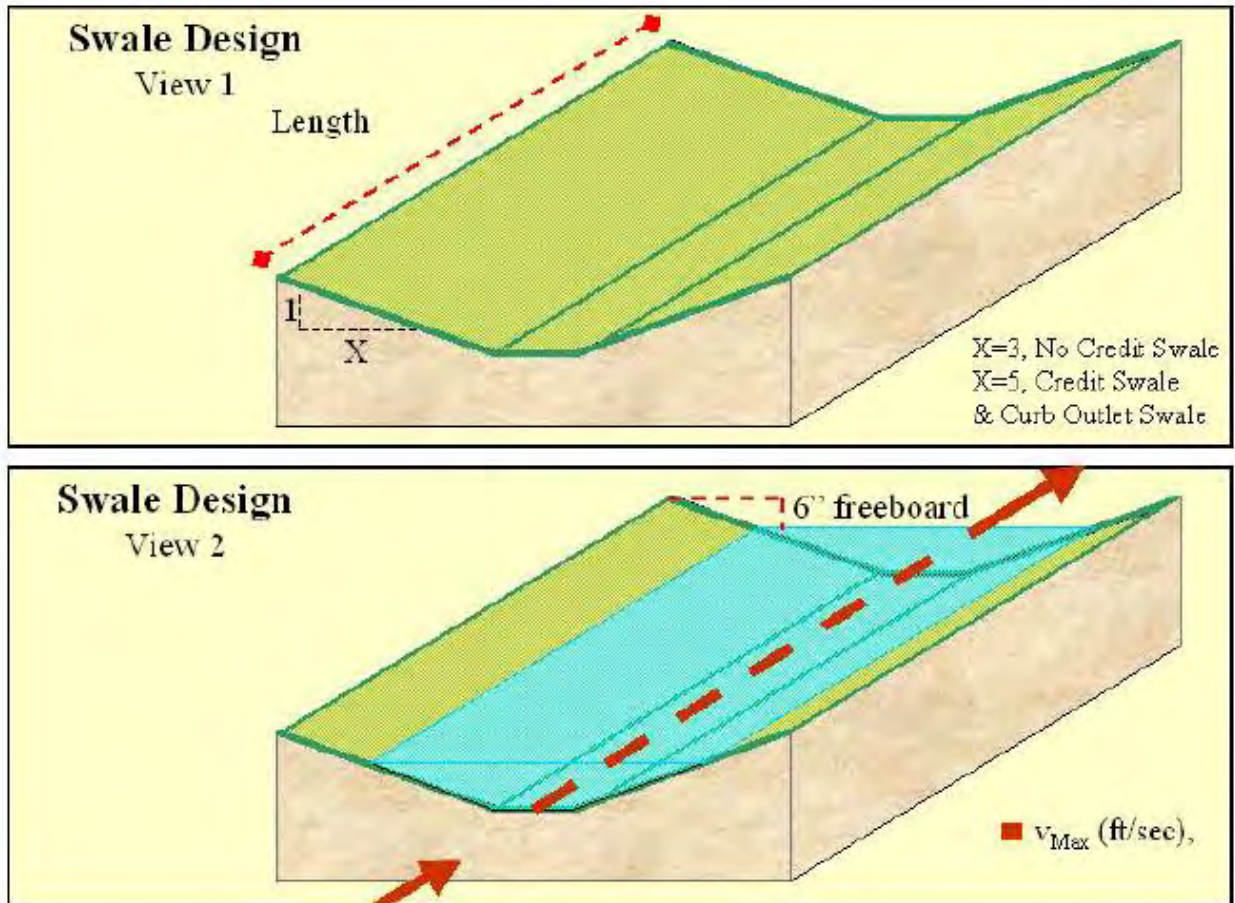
Grassed Swale Design Elements (NCDWQ, 2007)
